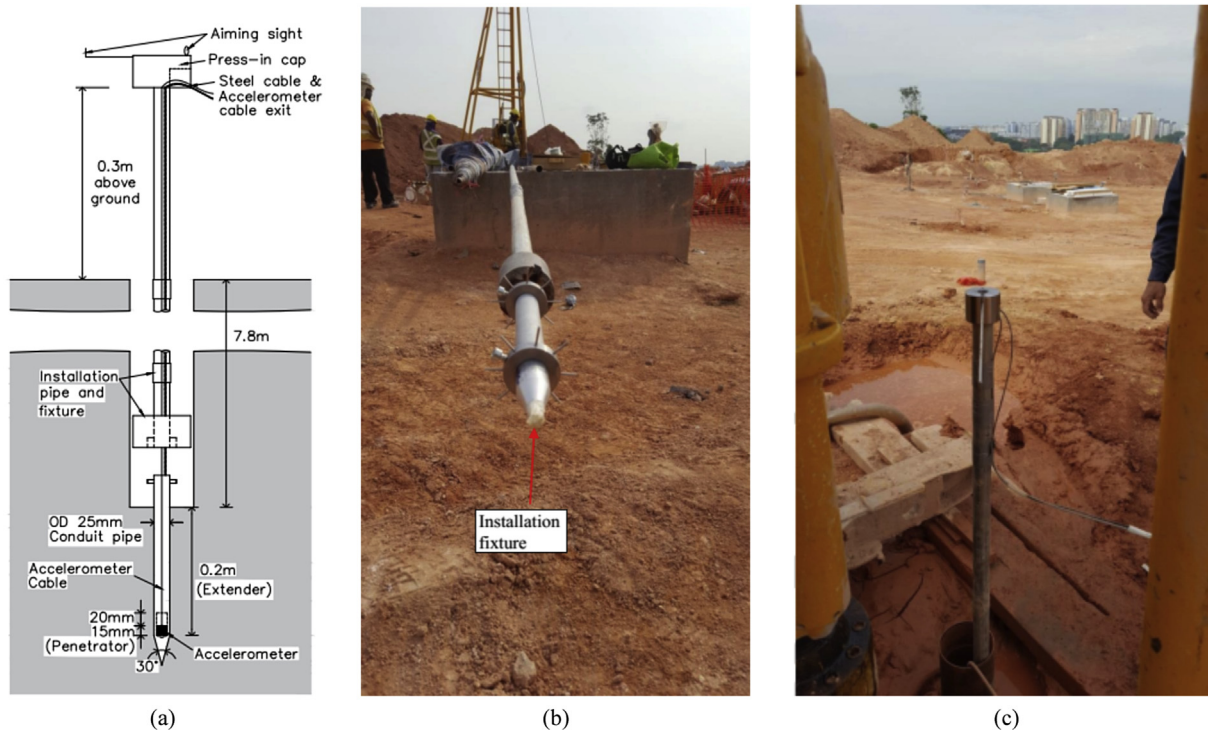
Installation of accelerometers in rock: (a) Accelerometer fixture; (b) Accelerometer with the metal casing attached to an installation pipe; and (c) Ensuring the alignment of the sensor orientation.
